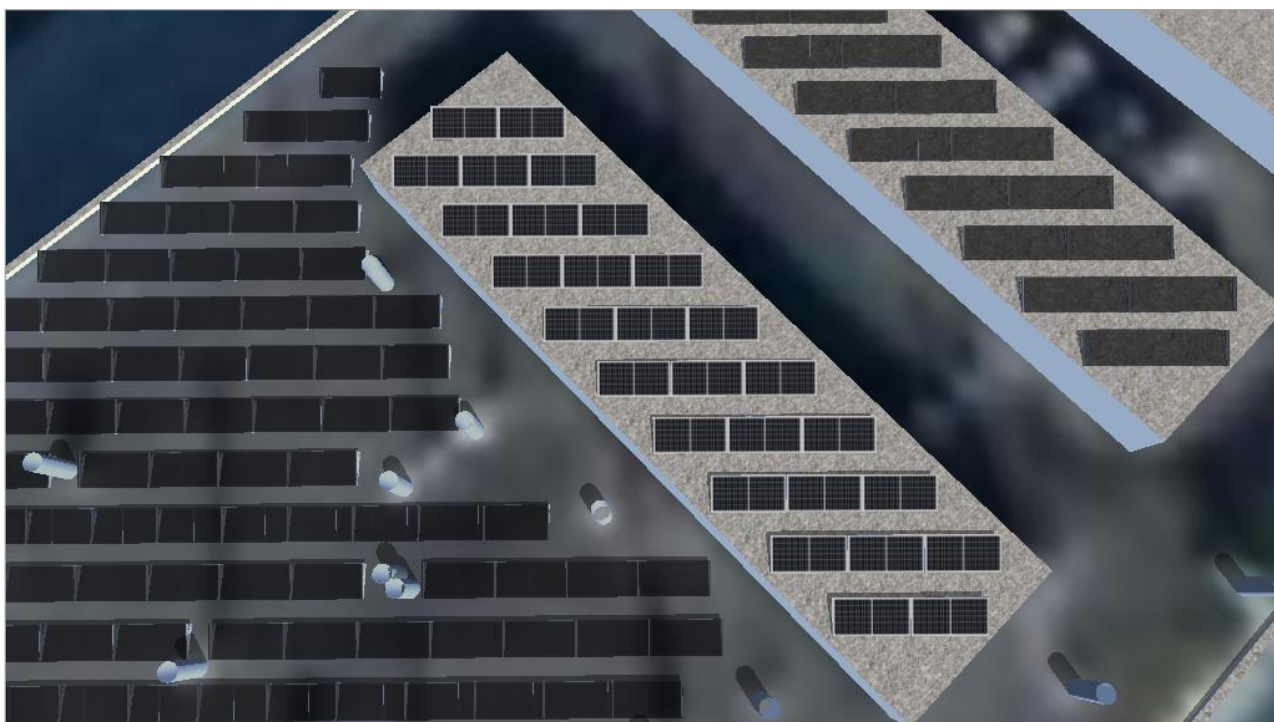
Module Area - Arbitrary Building 06-Mounting Surface Southwest
